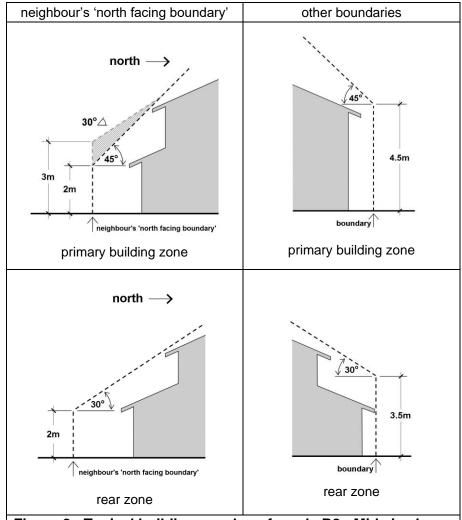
Typical building envelope for rule R8 - Mid sized blocks approved before 5 July 2013 & permissible encroachment under R9
